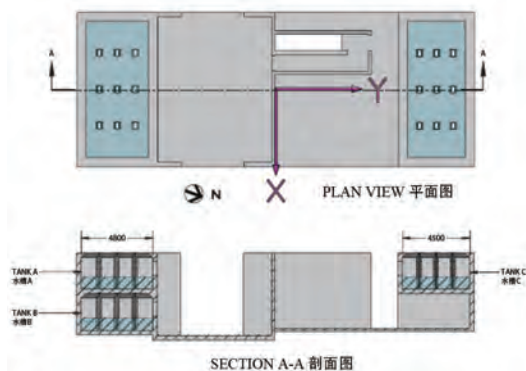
56 Leonard Damper Plan View. (Source: WSP)
